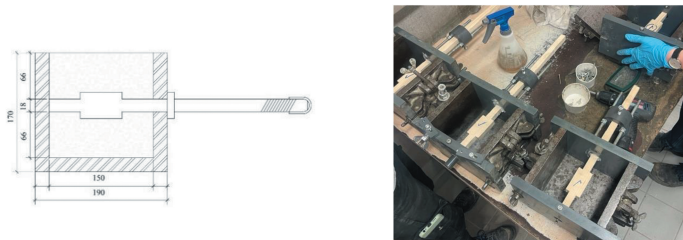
(a) Build-up and measurements of test specimen formwork; (b) manufacturing the pull-out test specimens with the first chosen wood geometry.
